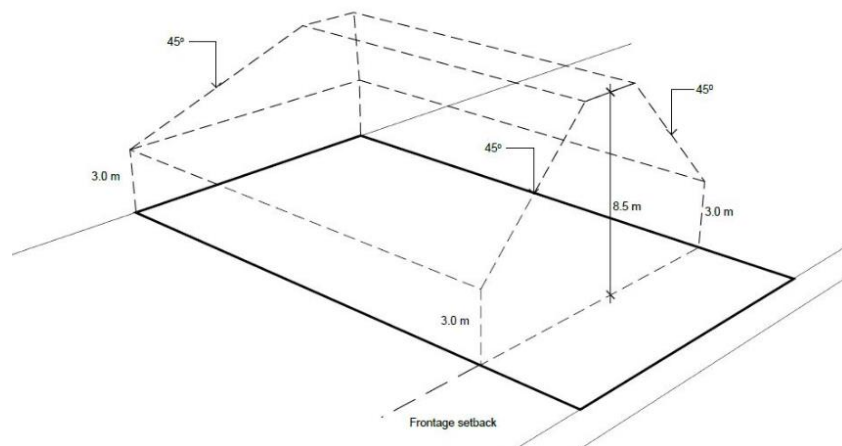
Building envelope as required by clause 8.4.2 A3(a) and clause 8.5.1 A2(a)
